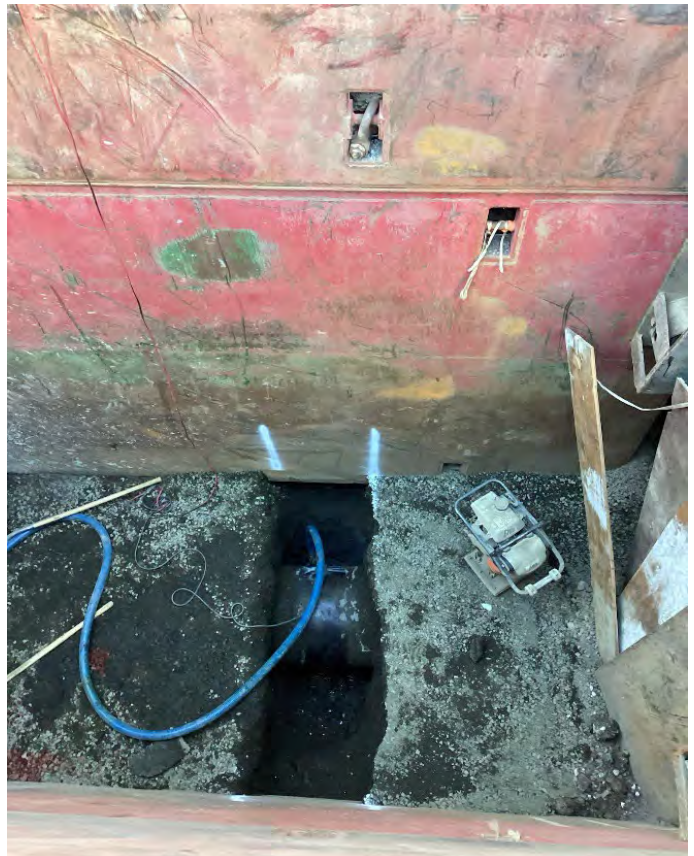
Trench Plug Construction - NW 9th Ave at Lovejoy
